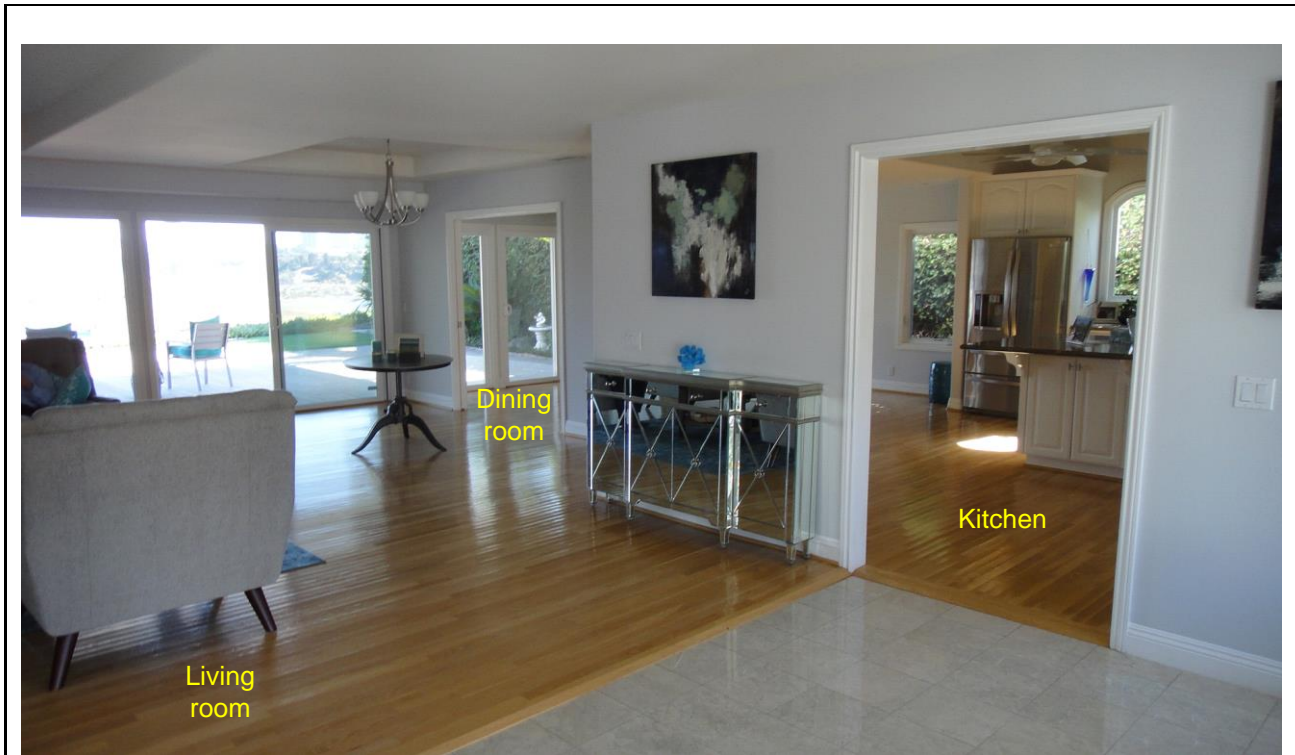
An overview of the living room, dining room, and kitchen. There is cupping of the strip wood flooring throughout this area.
